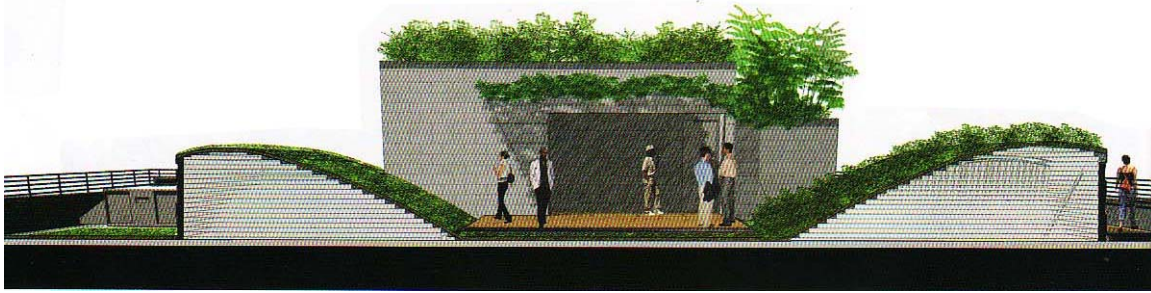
Elevation drawing of the ASLA Headquarters building's green roof. Courtesy MVVA
